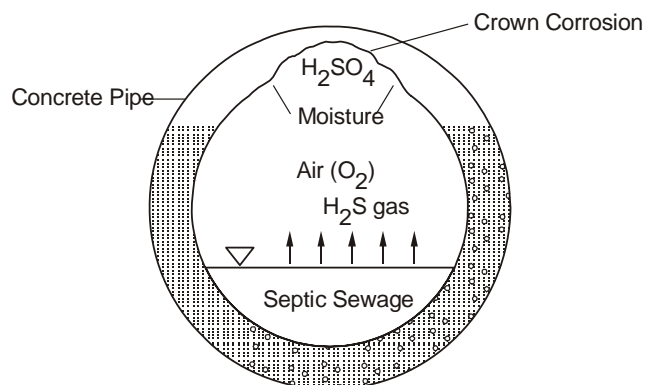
Crown Corrosion in Unlined Concrete Sewer
